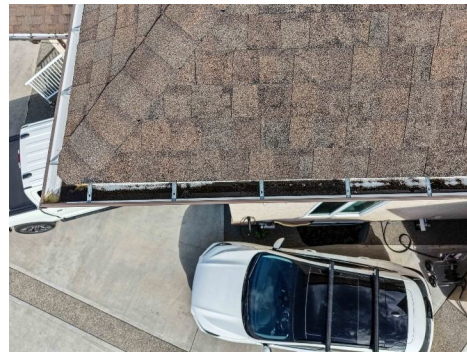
Detail 4 — Drainage / Gutters and Downspouts, North.
